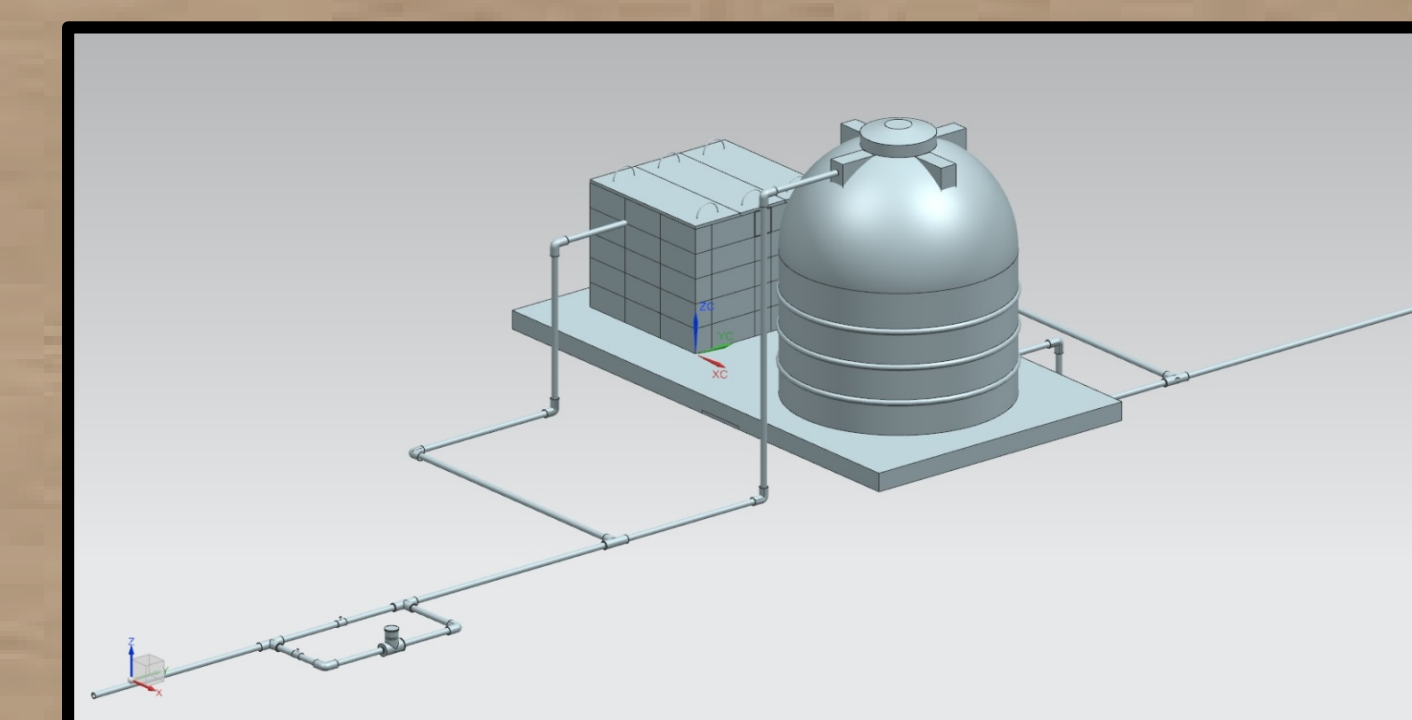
Configuration of in-line chlorinator, storage tank, and break pressure tank located at Waypoint 80.
